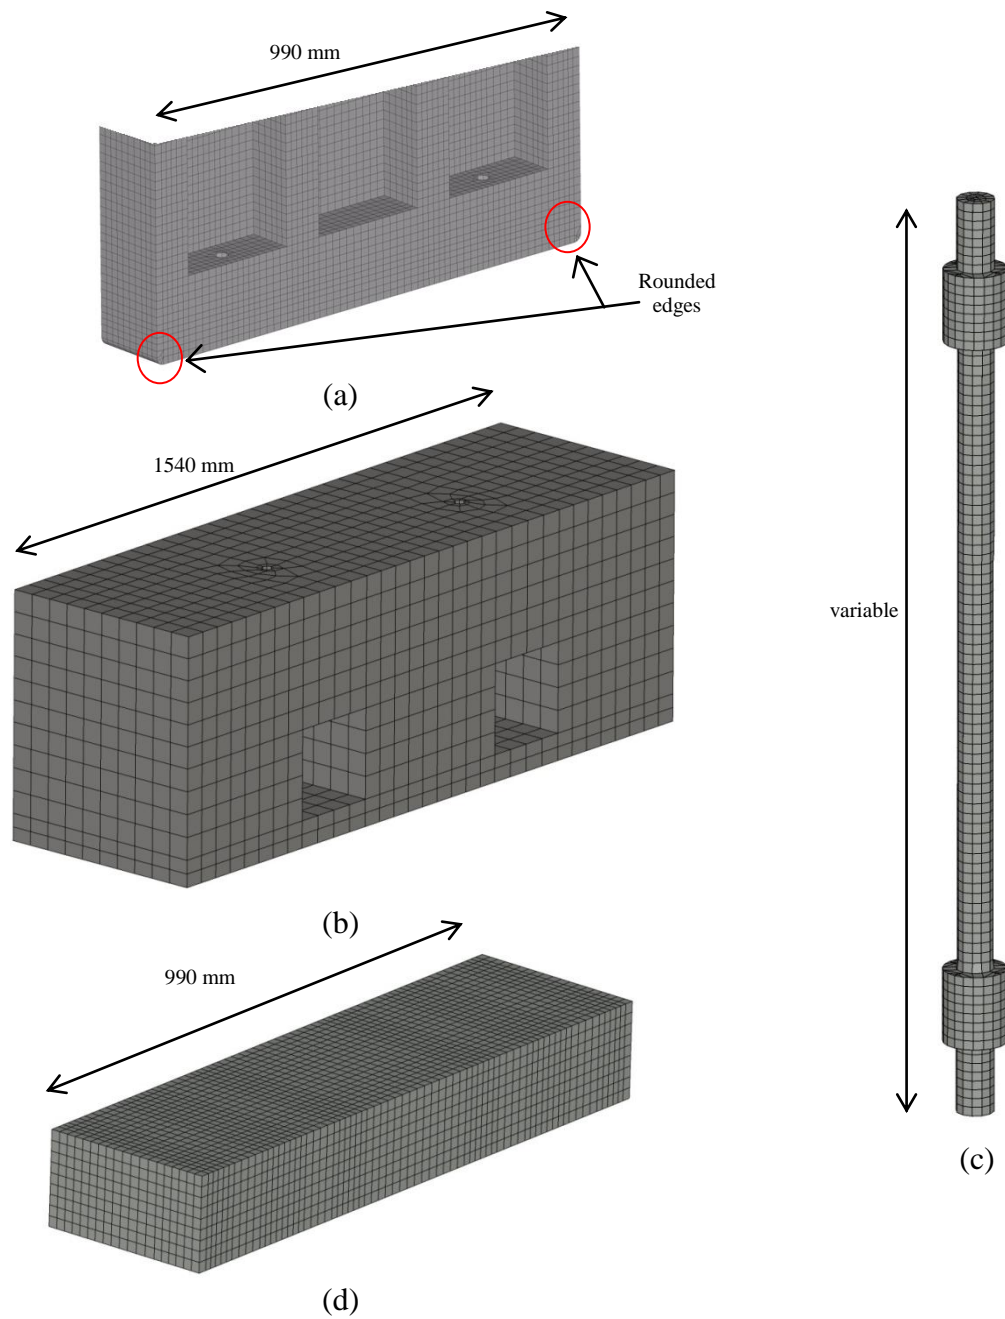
Finite element mesh (a) anchor block region (b) anchor bolts (c) concrete base block (d) head beam
